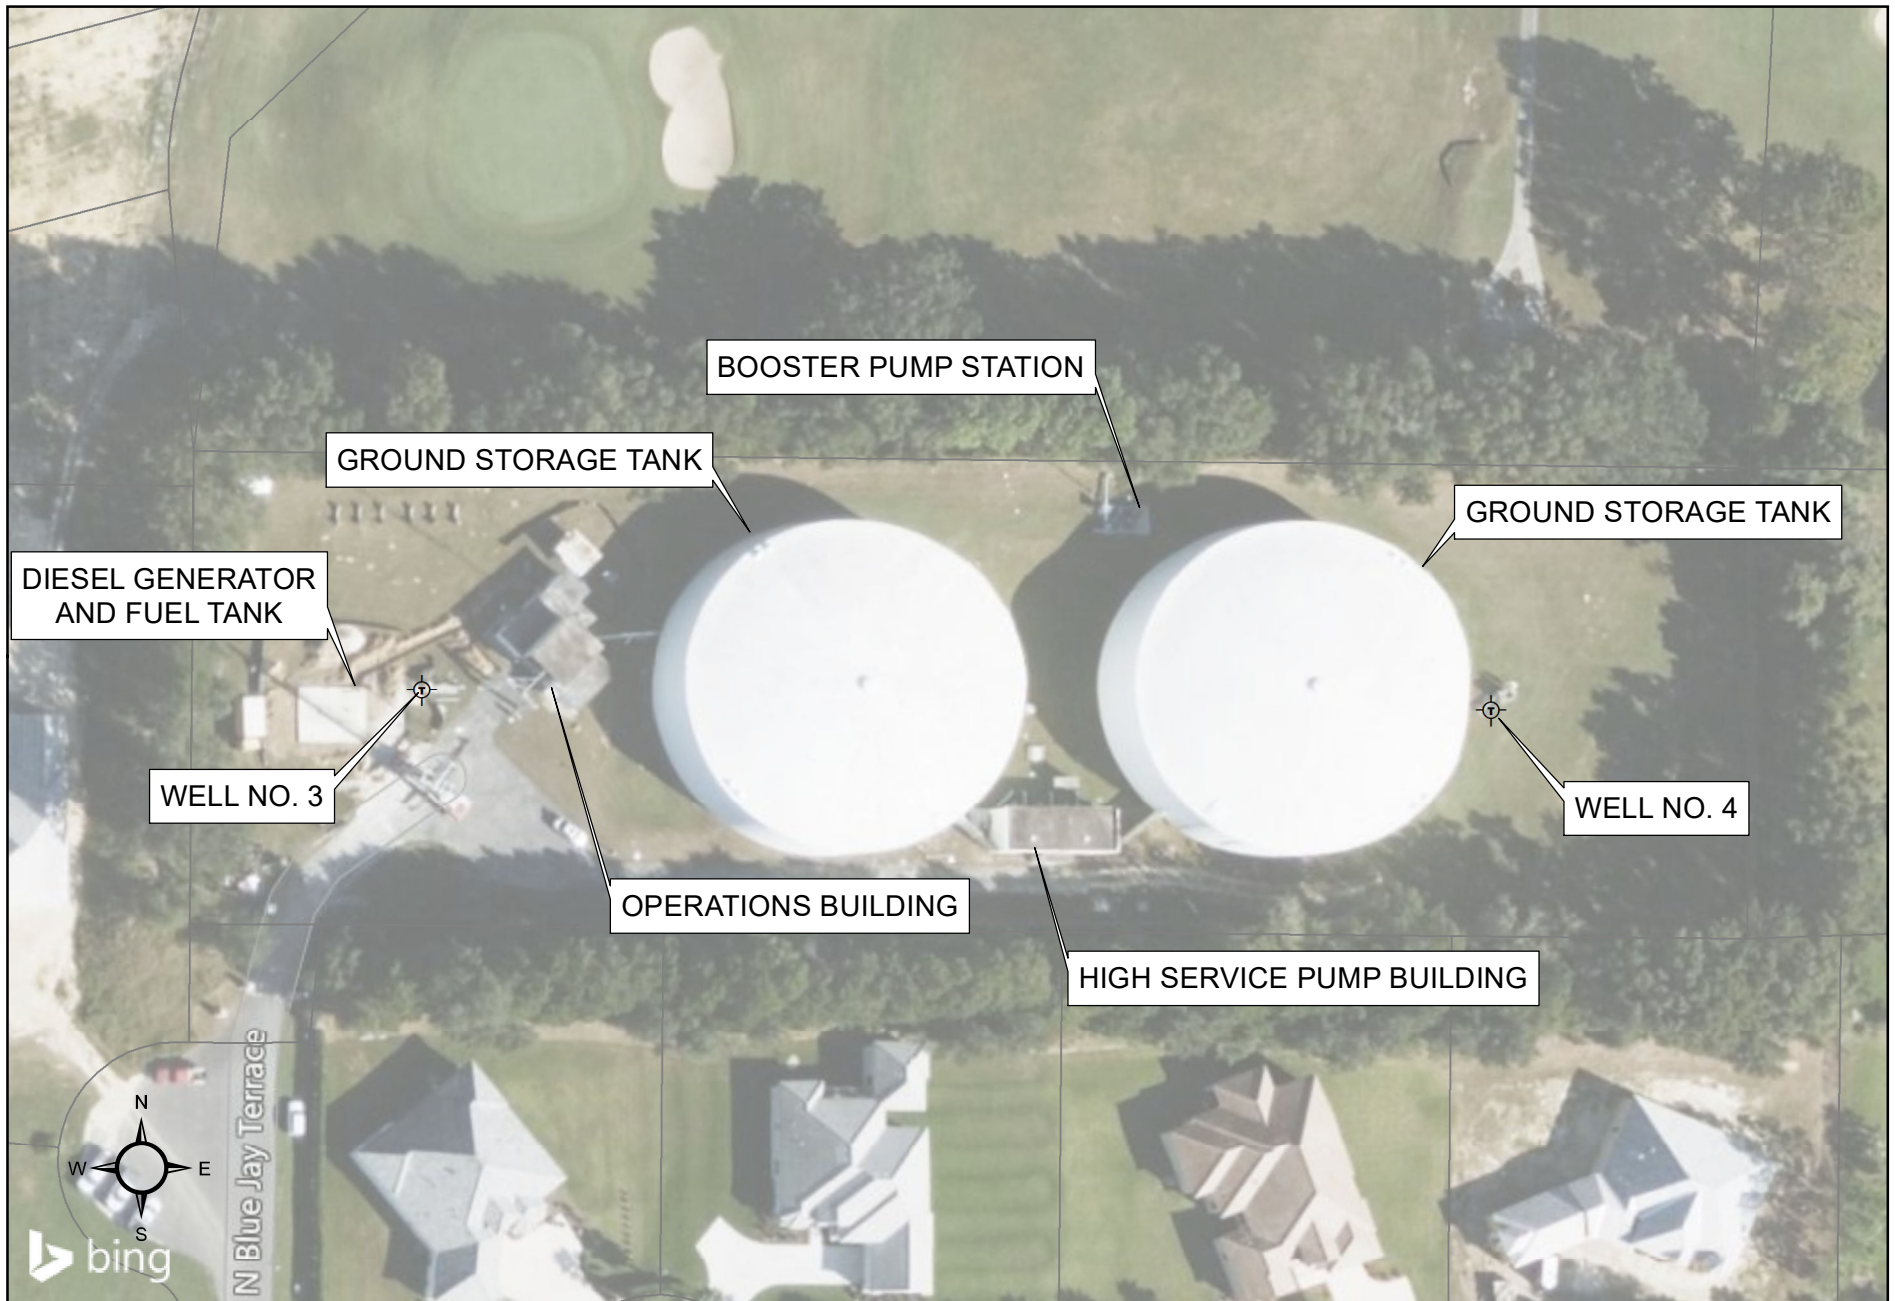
shows the site plan of the CAB-1 WTF. Water enters the CAB-1 facility through underground piping from the wellfield. The groundwater supply is disinfected with sodium hypochlorite and delivered to the ground storage tanks. The water is then pumped out to the distribution system via the HSPs and booster pumps.
